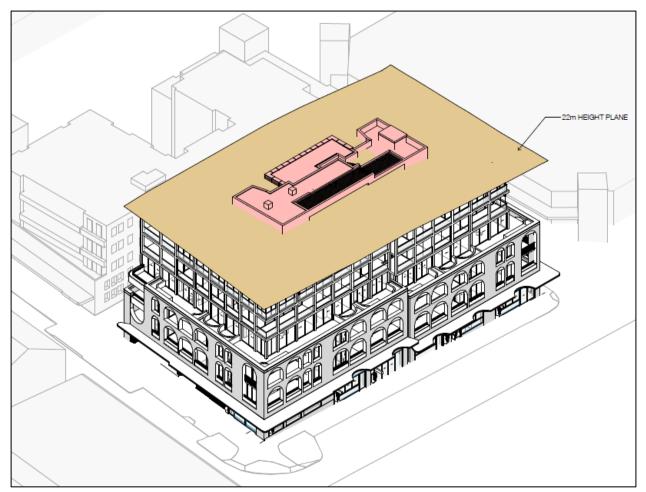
Proportion of built form comprising the site-specific clause (source: SJB Architects)
